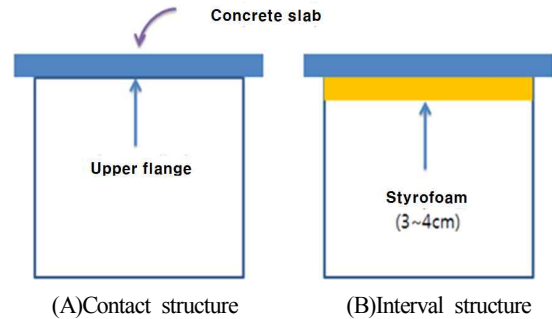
The construction of concrete slab and upper flange of the existing closed box girder type steel bridges.
